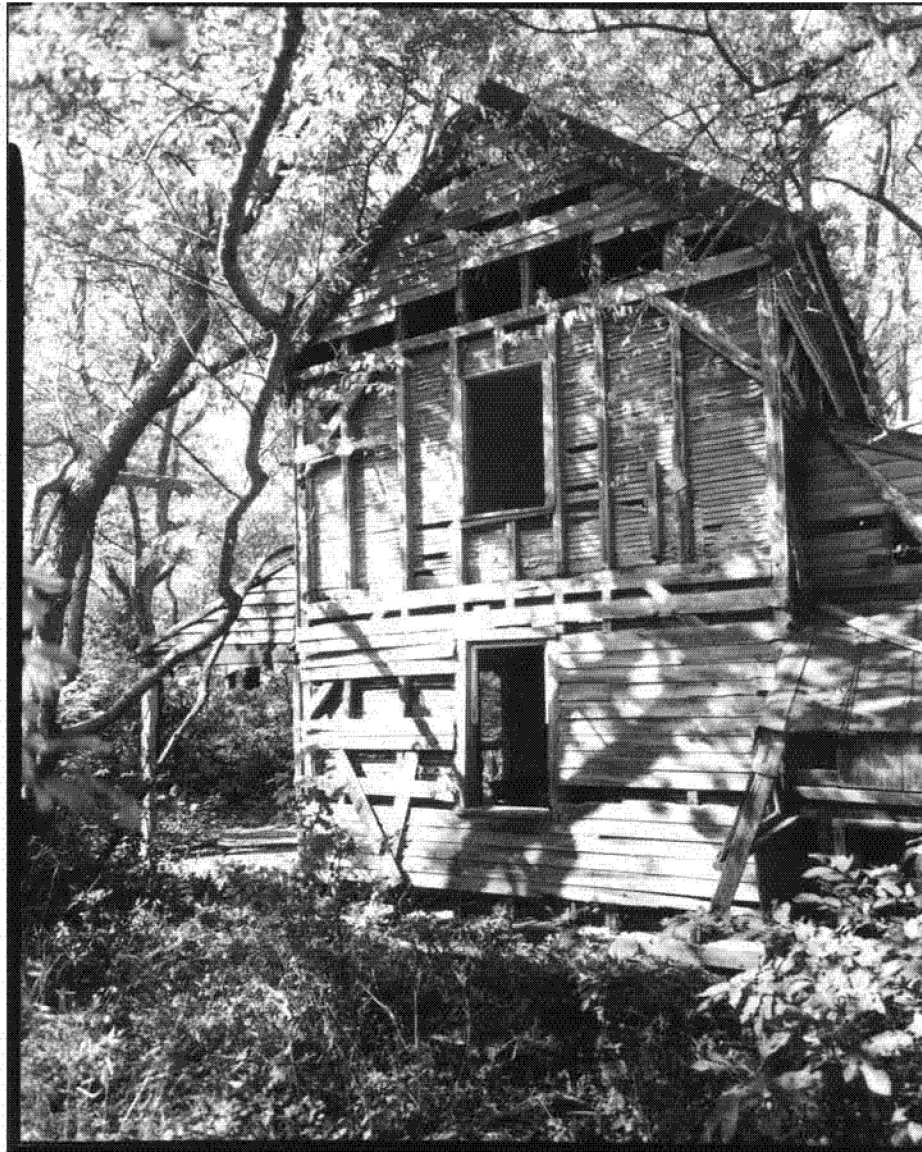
Hayes-Campbell Tenant House, perspective of the southeast elevation looking west.
